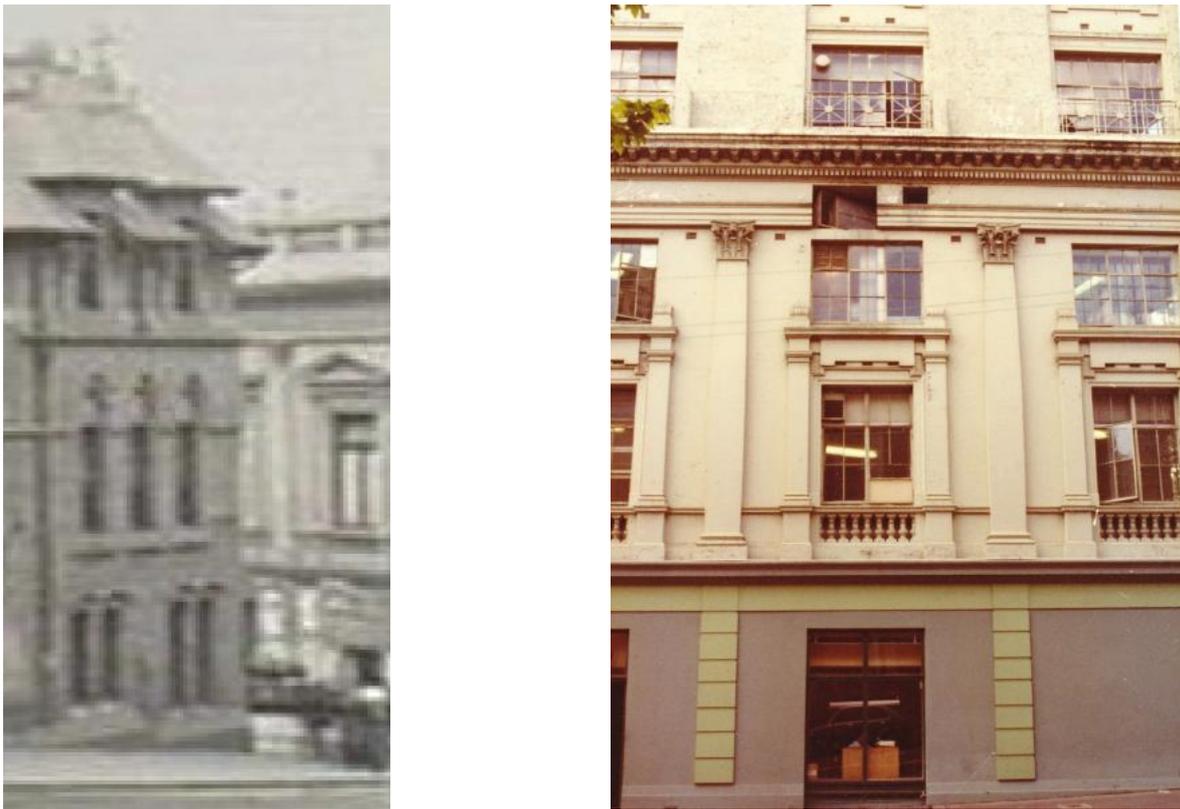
Comparative views of the Harrington Street elevation showing the original detail of the first floor windows (left) and the metal windows added in the 1920s (right). Note also the different configuration of the roof in the view on the left
